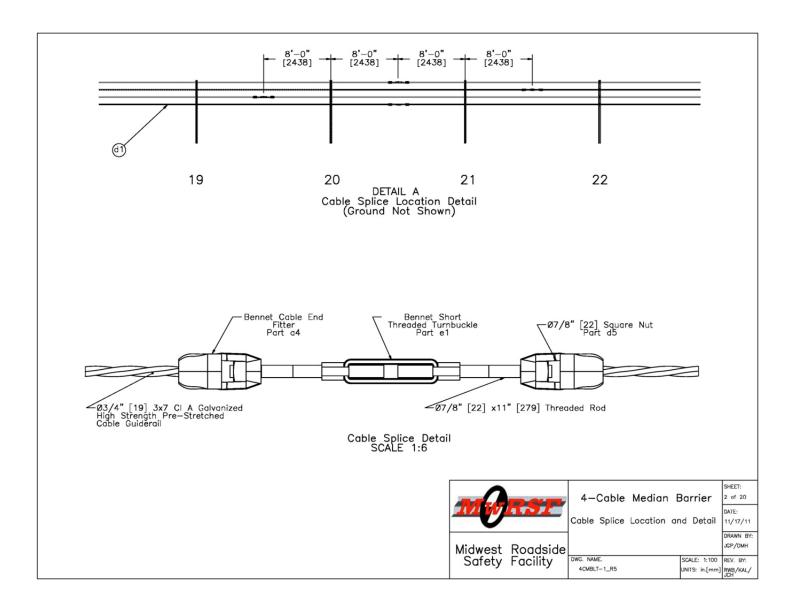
Cable Splice Layout, Test No. 4CMBLT-1
